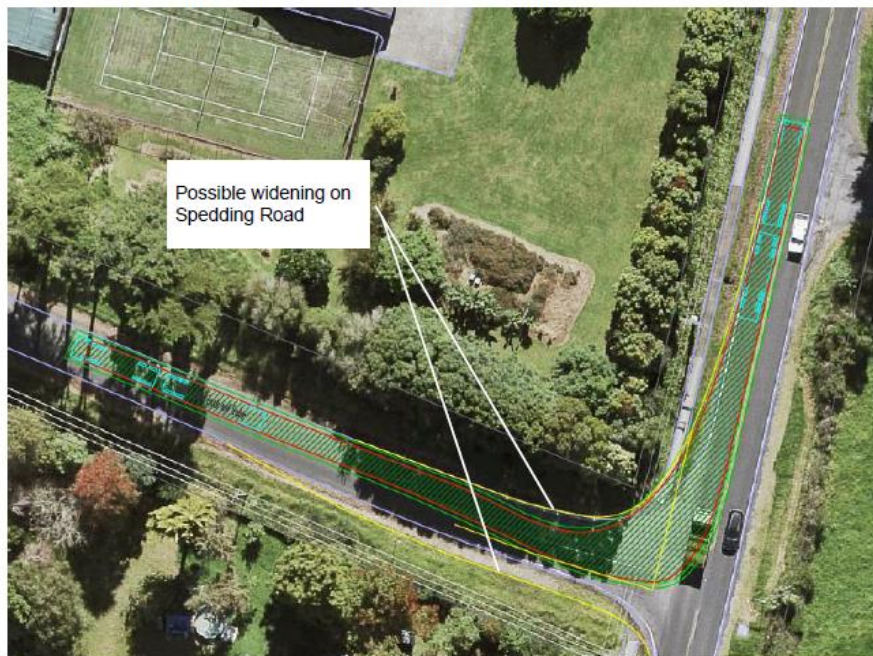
Trig Road / Spedding Road – construction vehicle tracking for left out movement with possible widening (from applicant’s Traffic Impact Assessment)
